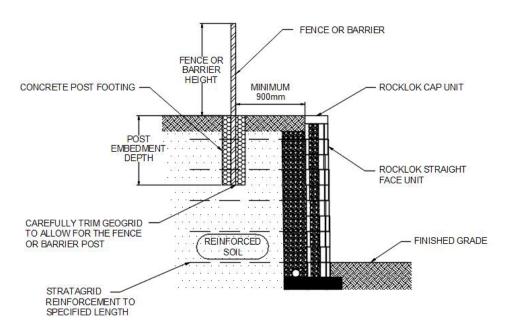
Barrier or Fences on top of Rocklok® wall
